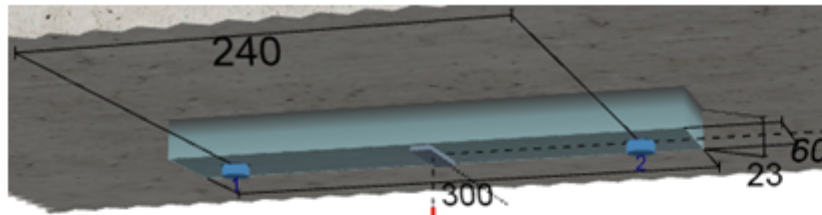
Typical adhesive anchor and roof hanger plate assembly.
